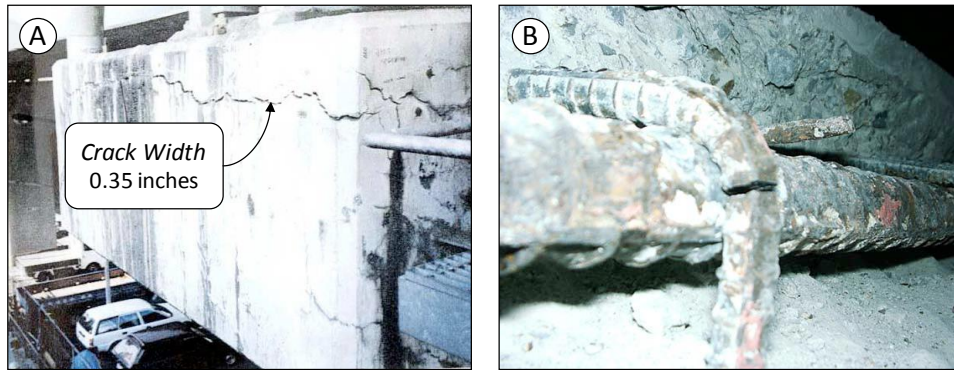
(A) Typical Pier Damage (B) Associated Reinforcement Fracture (Miyagawa 2006)
